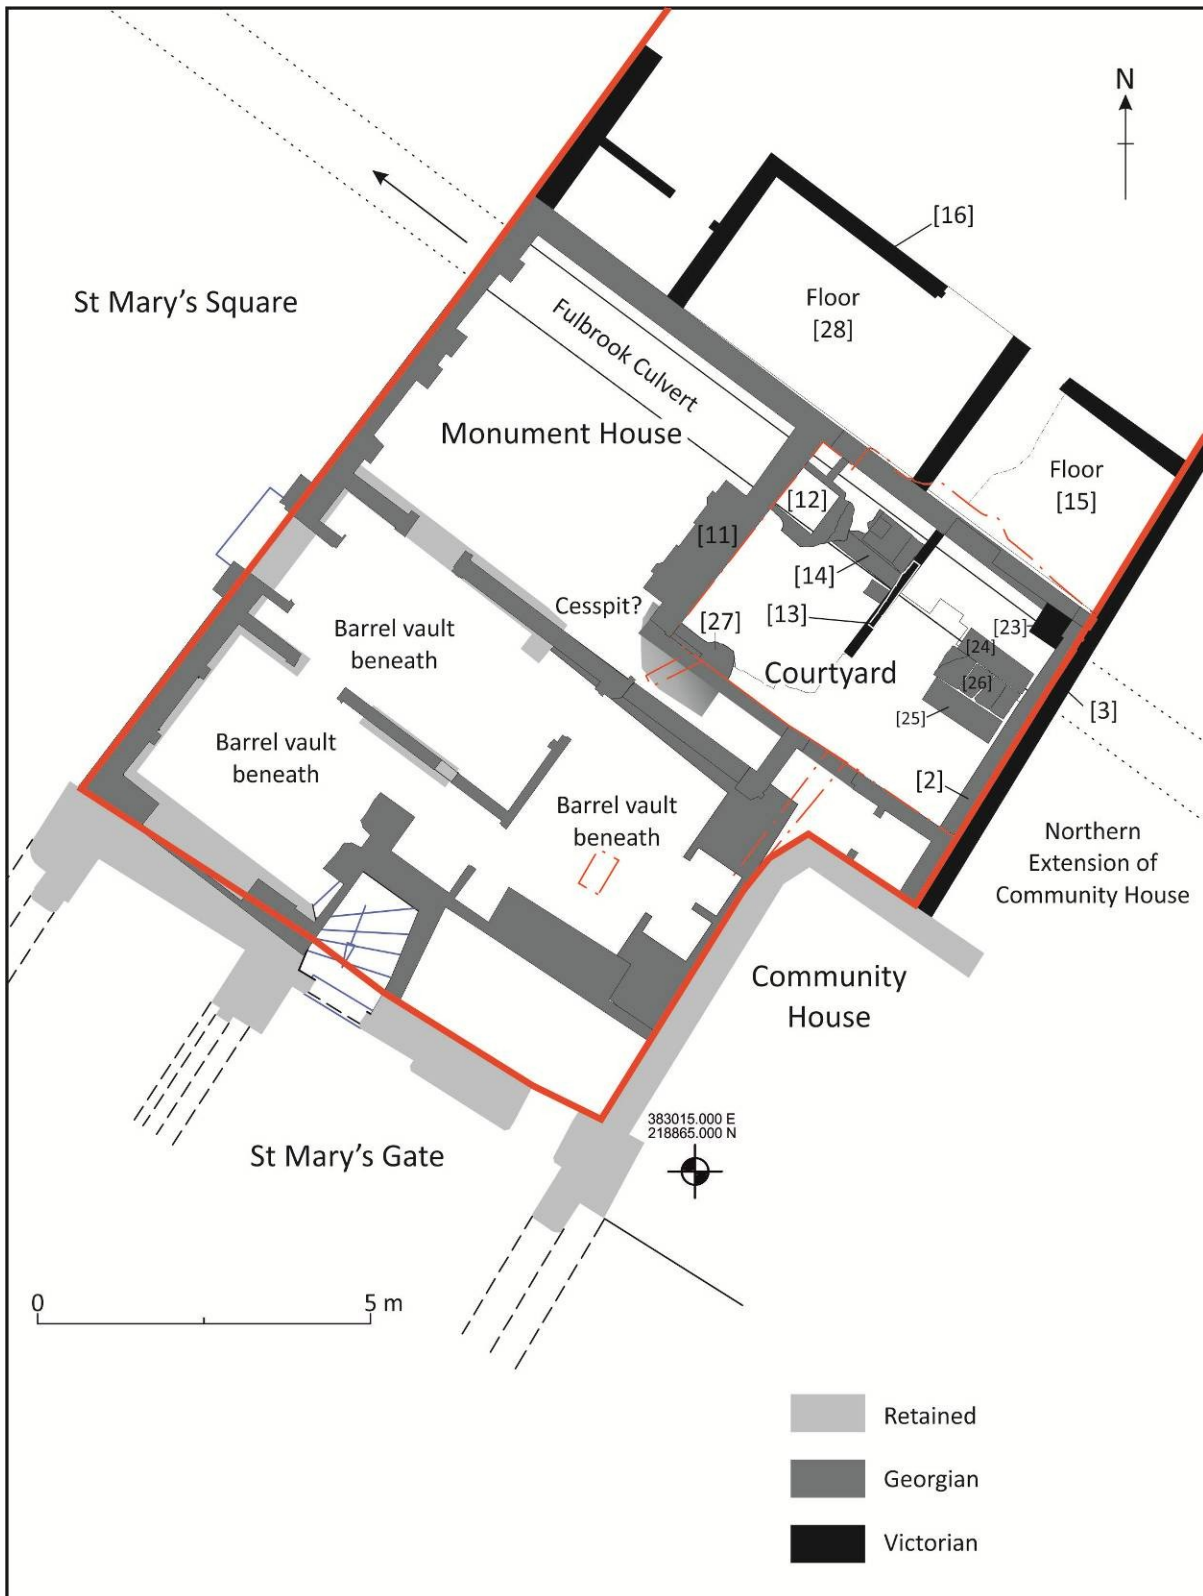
Plan of Georgian and Victorian structures at Monument House
